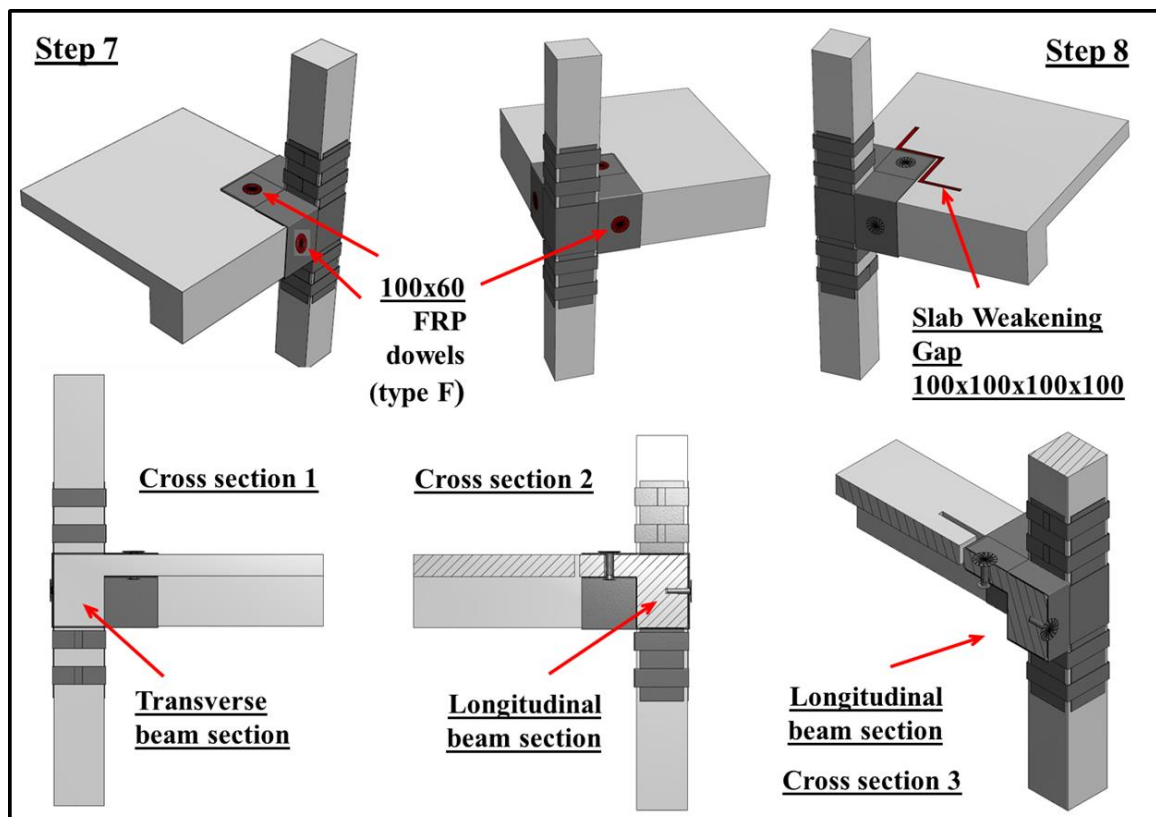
GFRP sequence of application Joint type 1, Steps 7 to 8; cross sections showing anchorage.
